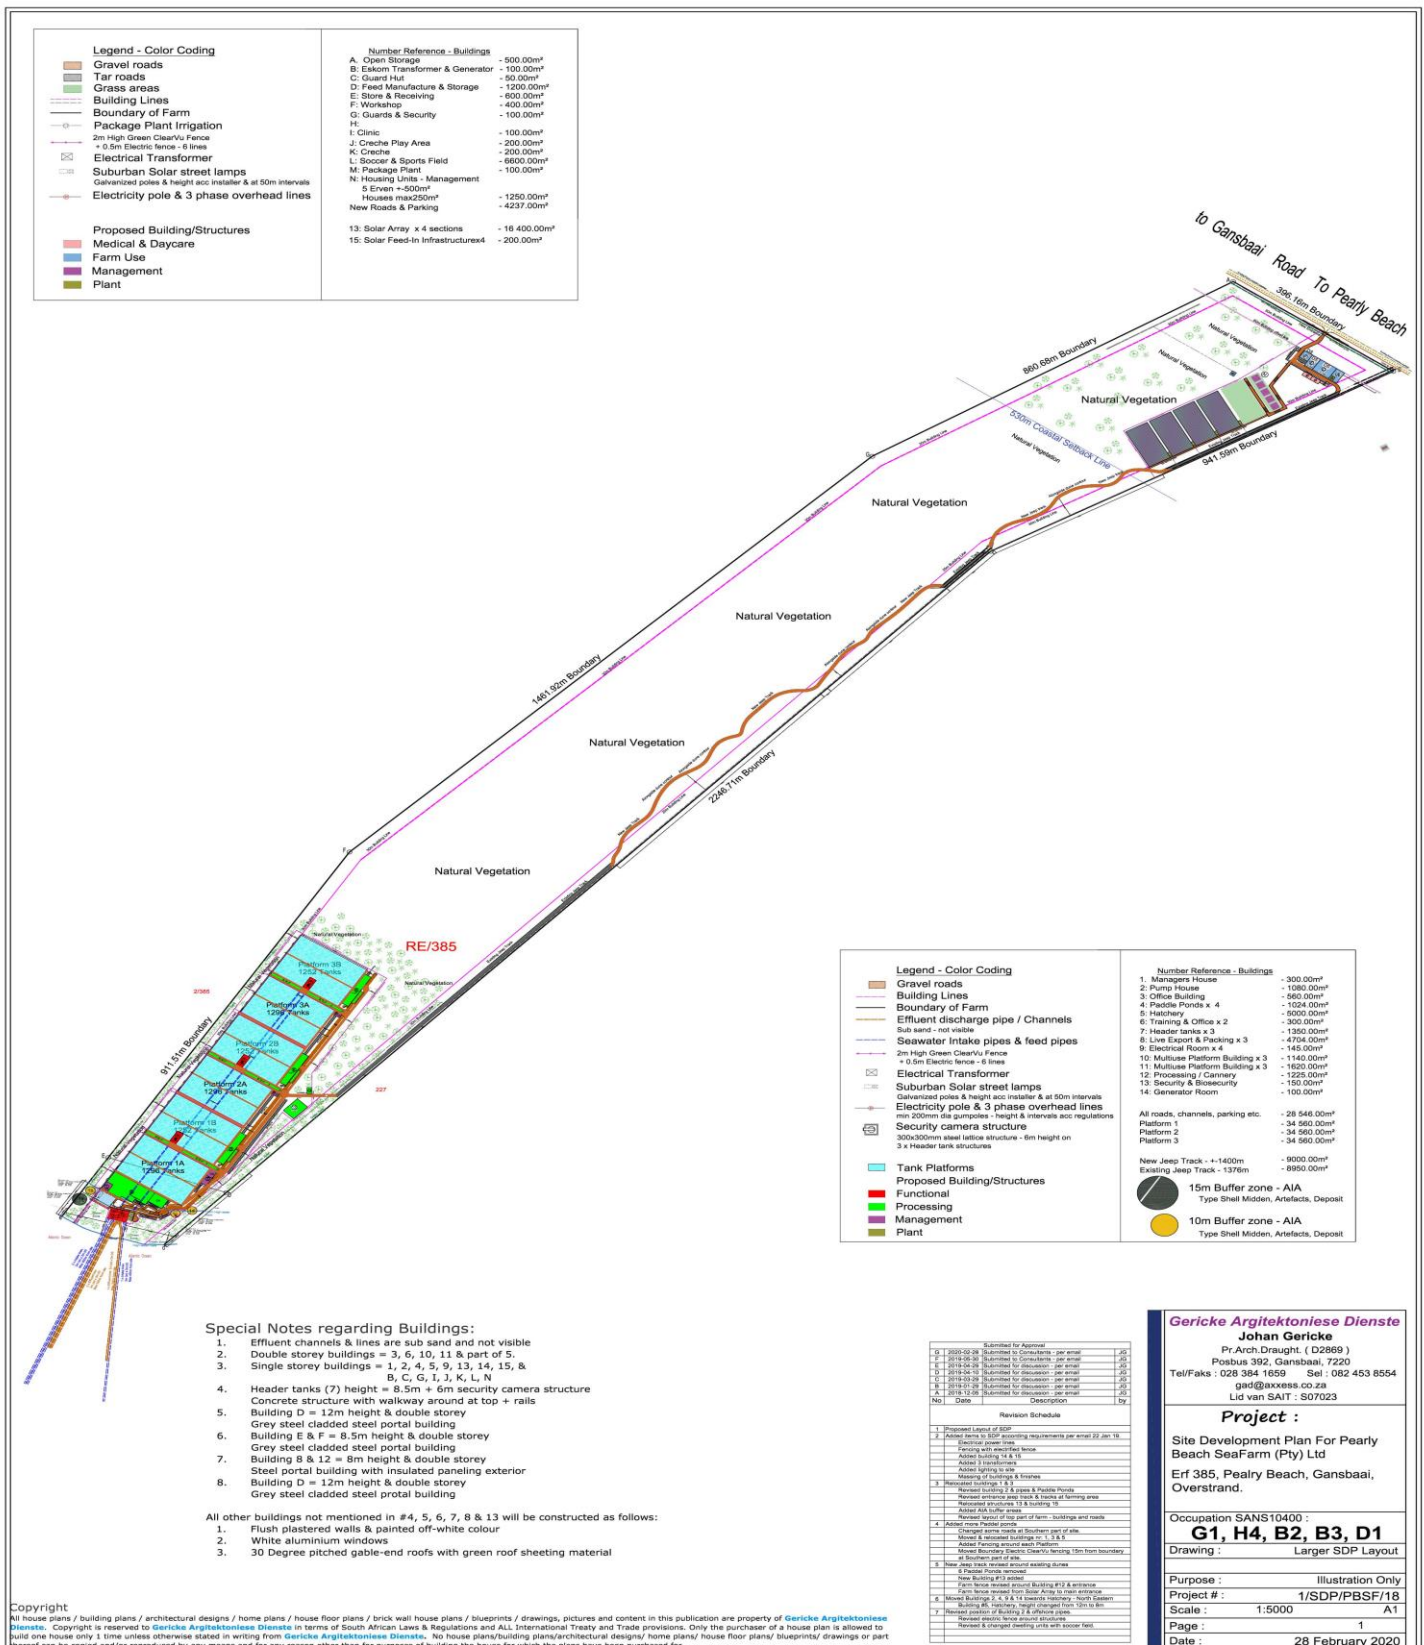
Site Development Plan of the areas for construction on a Portion of Remainder of Farm No. 385, Pearly Beach
